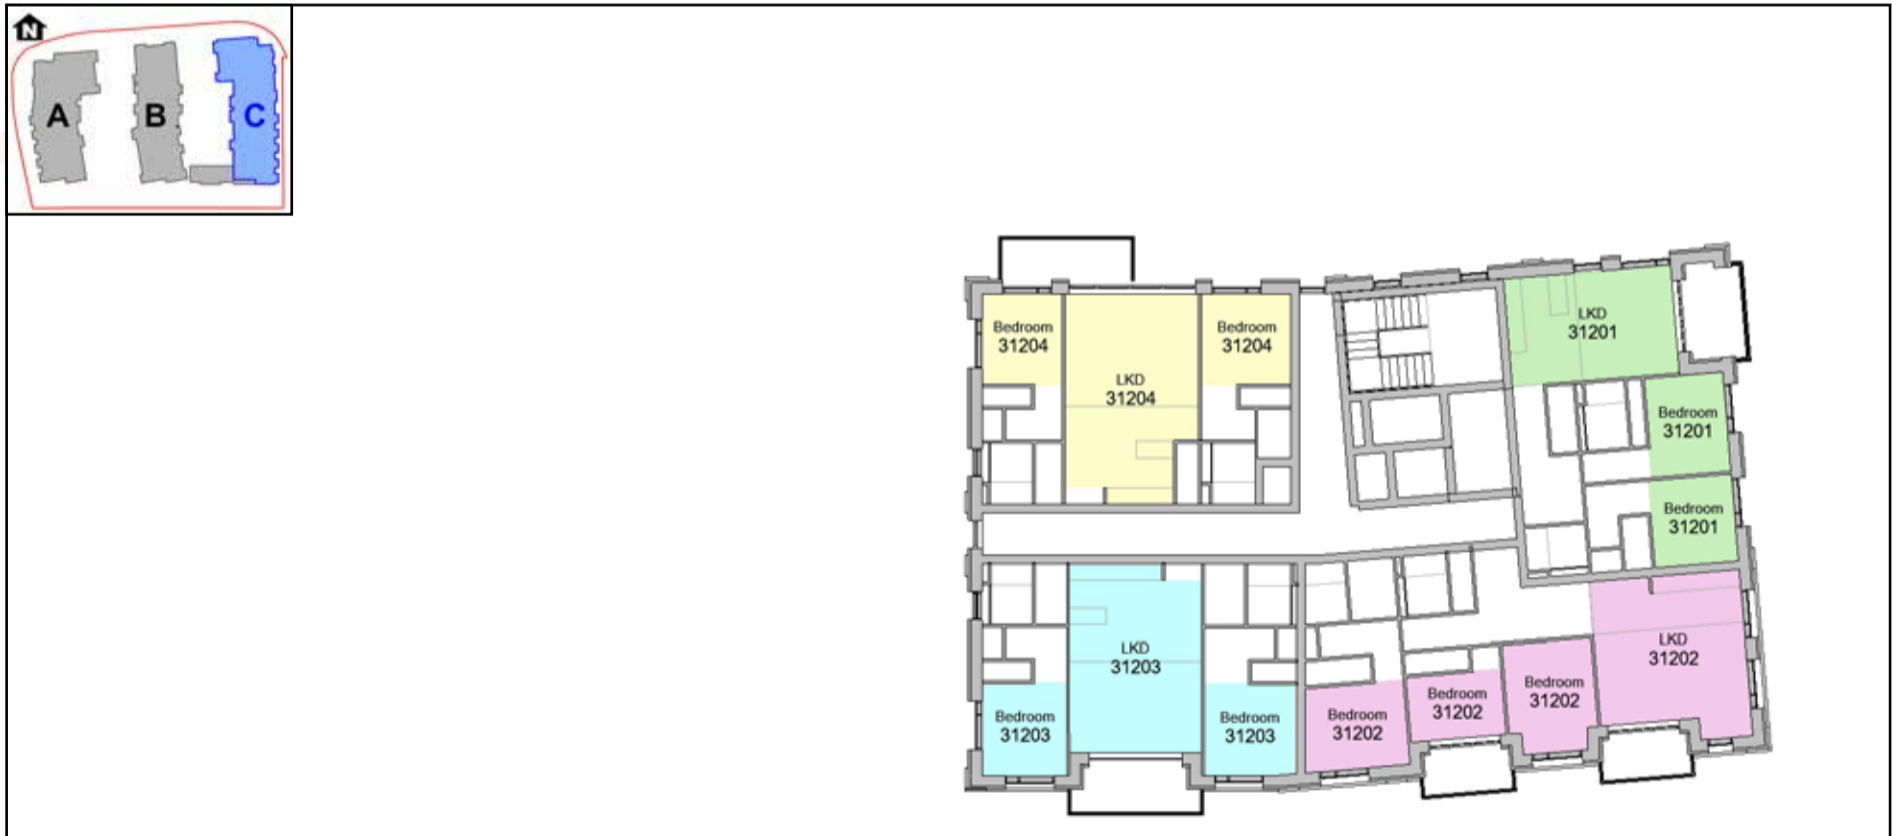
Floor plan of assessed rooms with keyplan highlighting the assessed block.
